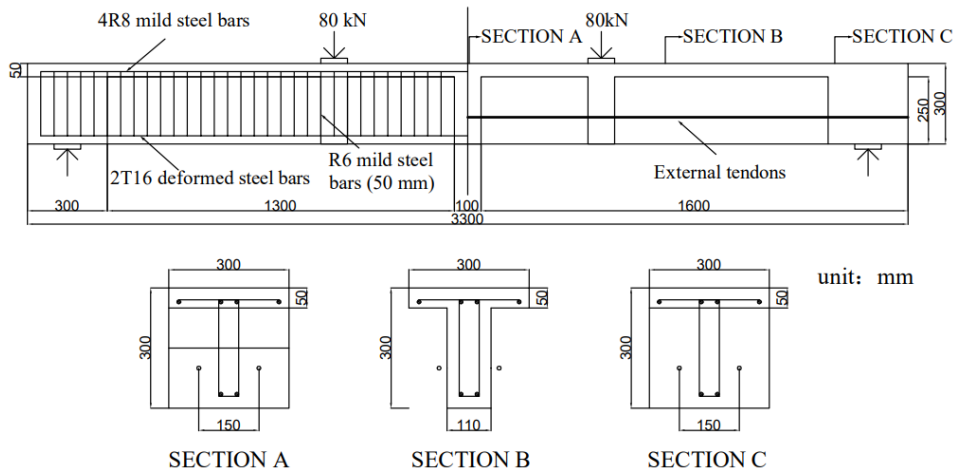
The reinforcement drawing and section dimension of T-beam [14]
